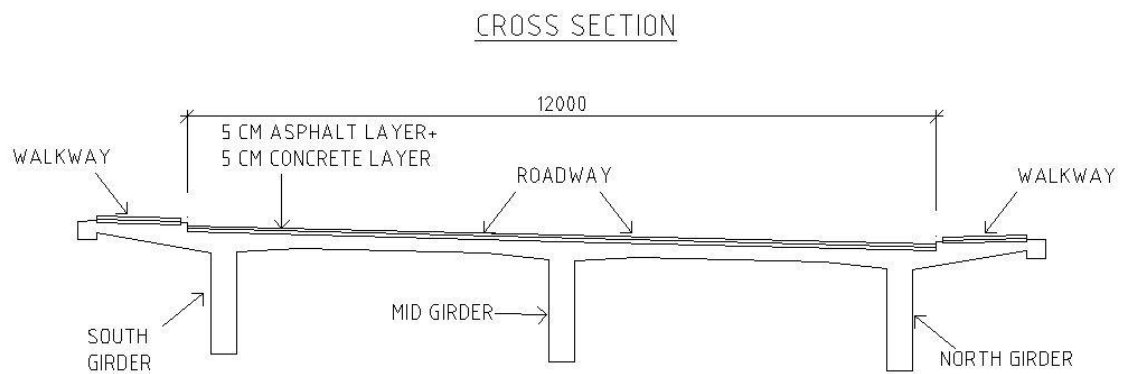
Cross section of the bridge "Gruvvägsbron" in Kiruna. It is built of concrete. There is an asphalt layer on the roadway and the walkway.
